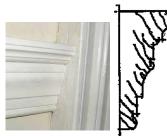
Room 105 chair rail found on the northwest wall. (GWWO photo, 2005) and section detail.
